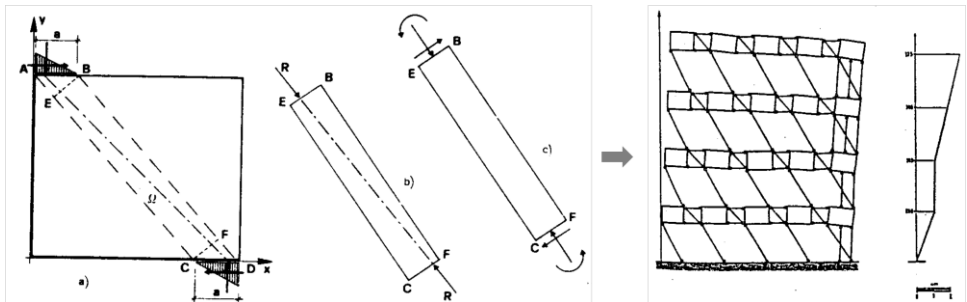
Modelling of masonry walls through equivalent struts: identification of the compressed strut [8], [9]
